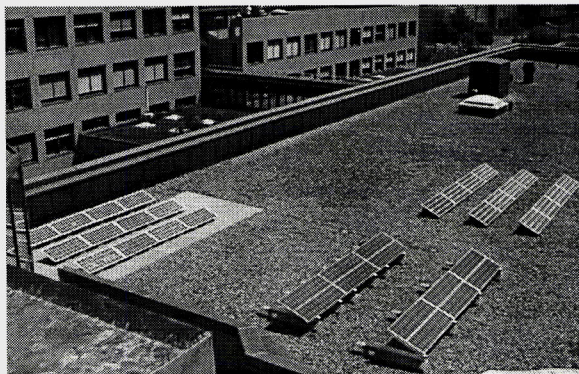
The new Demosite phase features among others a new flat roof systems exhibition site right near the parking lot site. As soon as it was started, three new flat roof systems were installed.
